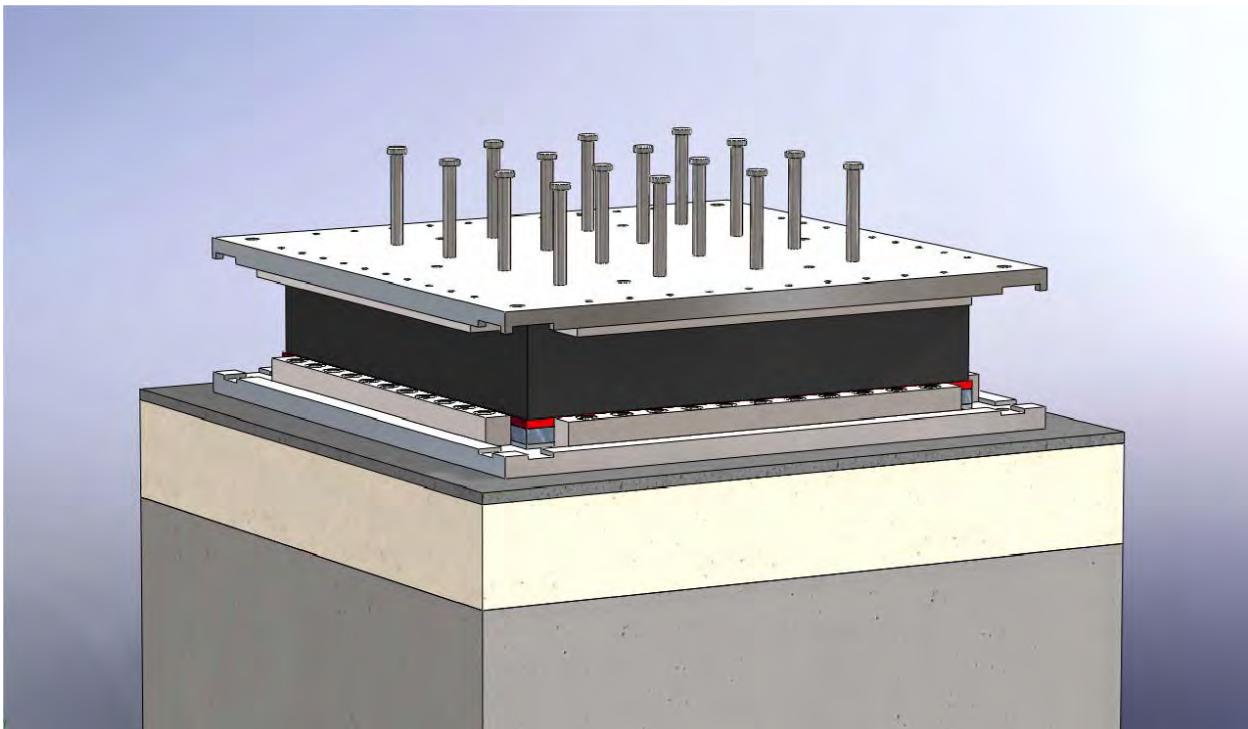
Installed ASB (Anti-Seismic Bearing) Assembly
